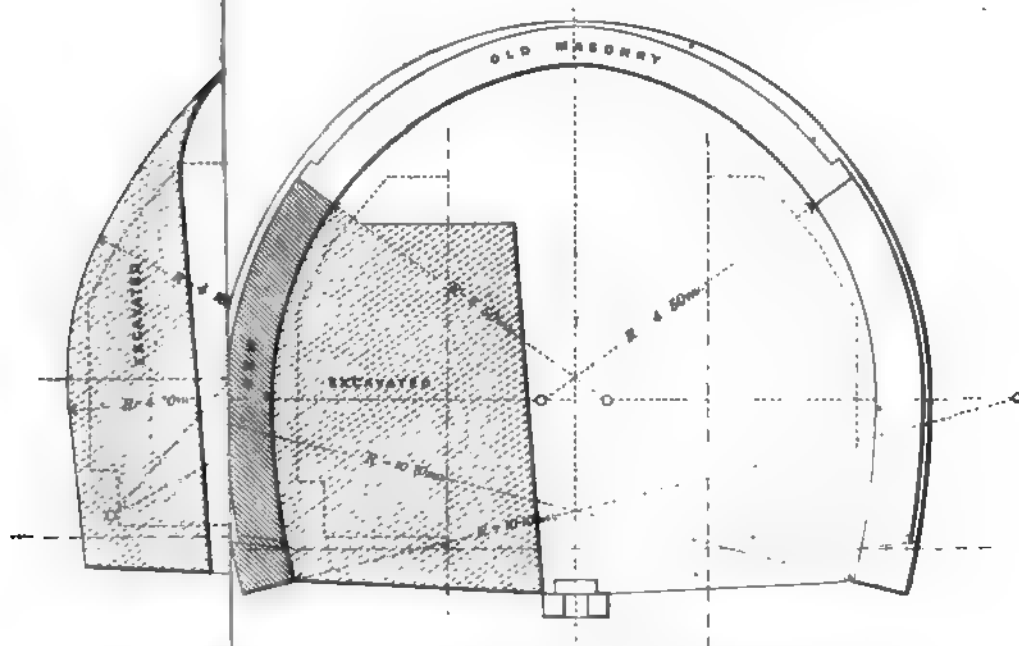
ST. GOTTHARD TUNNEL. TYPE OF CONSTRUCTION NO. 3.
